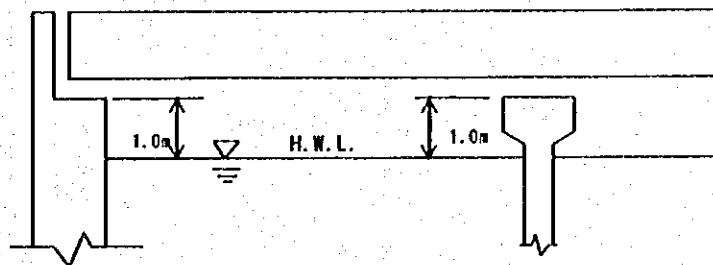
Clearance between Bearing Level and H.W.L. (SLS)
